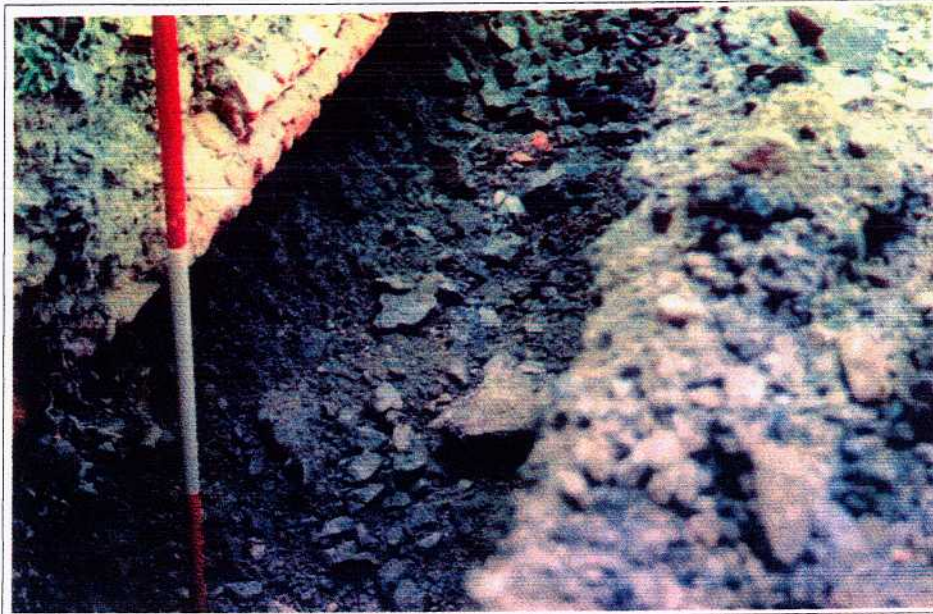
Cellar ceiling vault 1003 showing gravel in section
